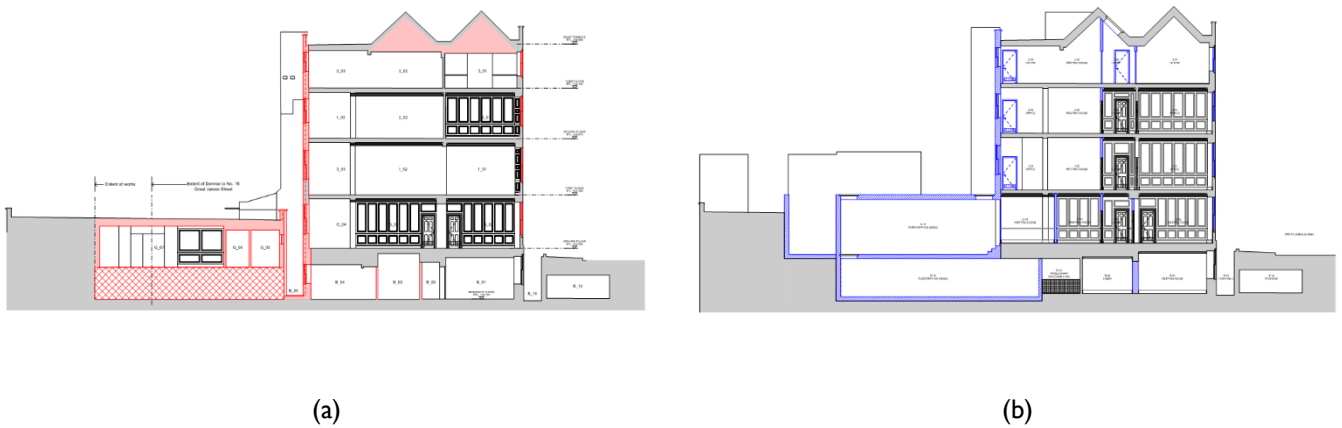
Owen Architects cross section DD - (a) Existing (red indicates excavation and demolition areas) and (b) proposed (blue indicates new structural components) building layout.
